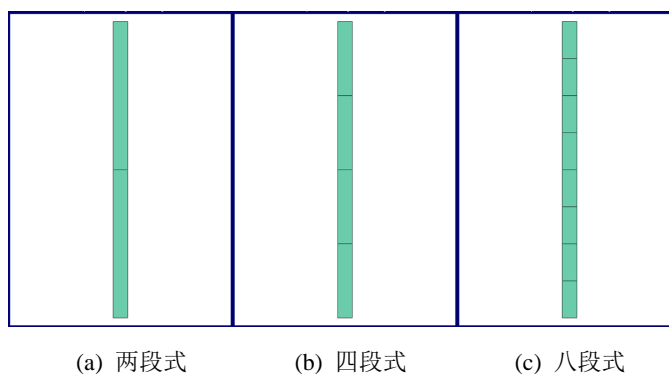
Schematic diagram of pipe pile-CFG pile segment construction
